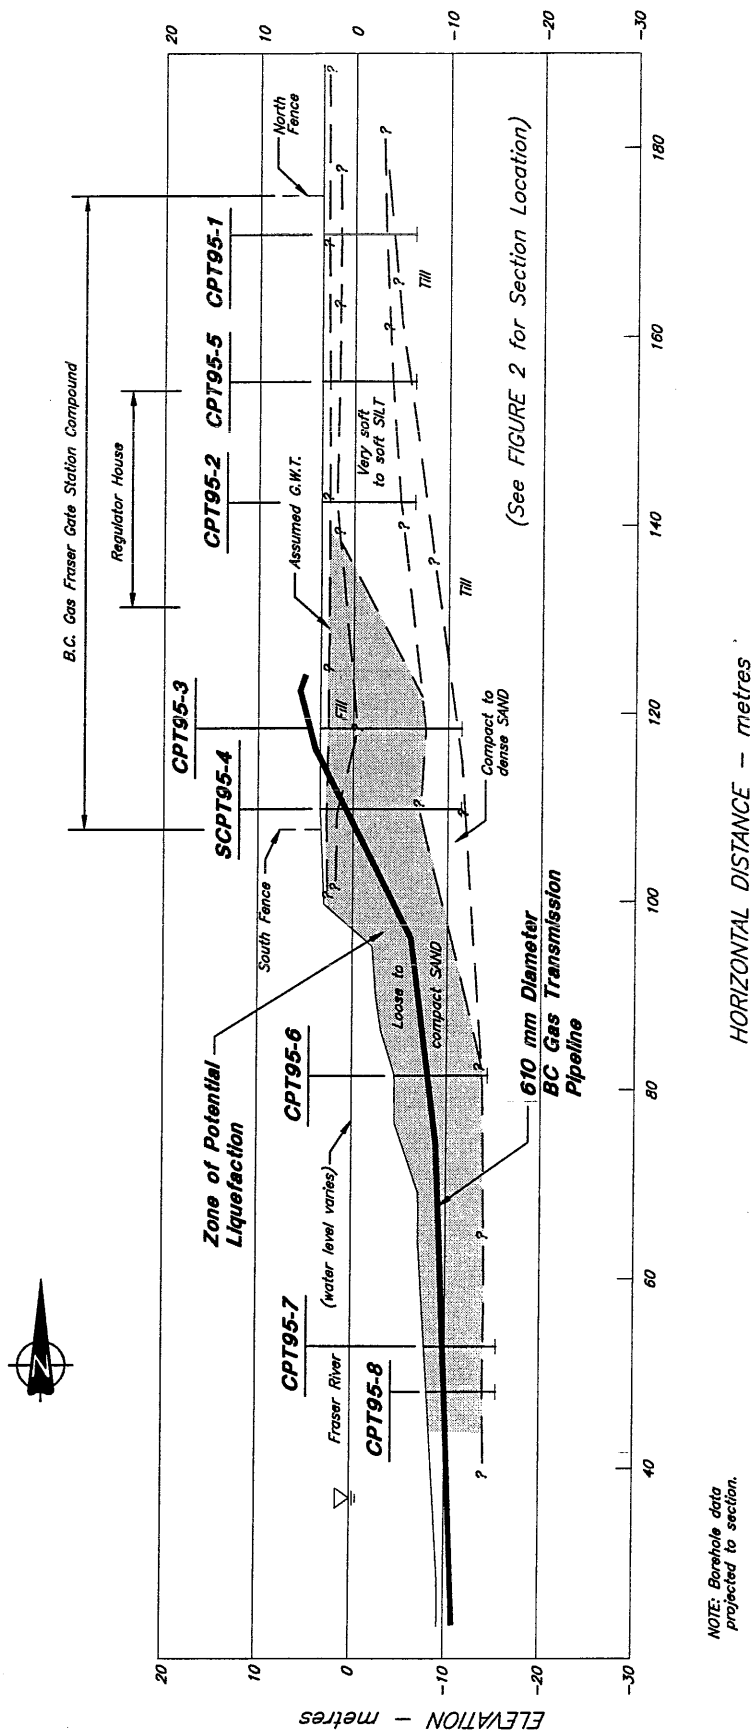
Profile of soil stratigraphy, predicted zone of potential liquefaction, and alignment of pipeline 610 mm diameter pipeline
